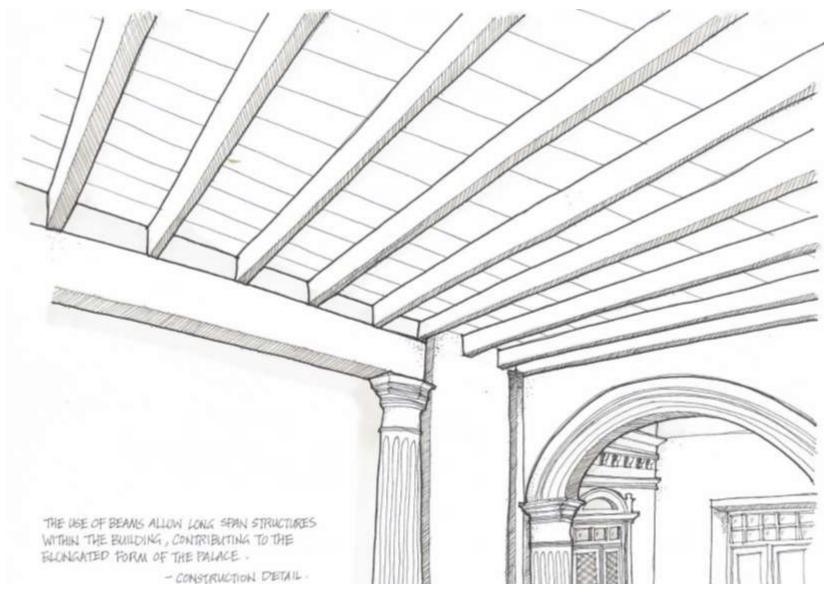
Exposed floor girder can be seen at the ceiling of *Istana Bandar*.
